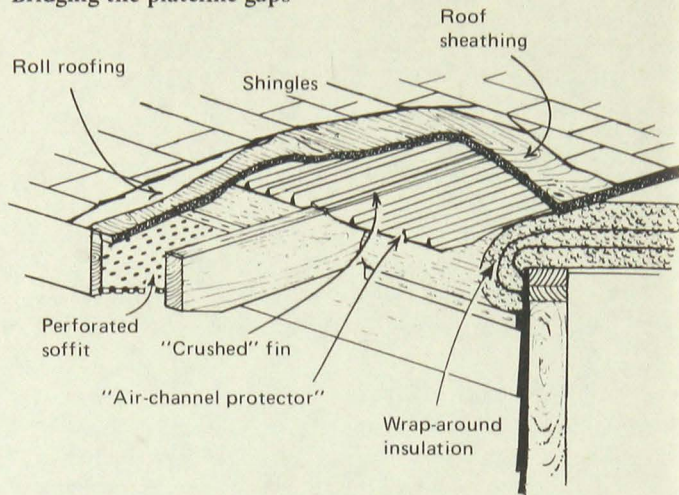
Sketch of plate-gap with "air passage protector" in position between sheathing and wall plates.
